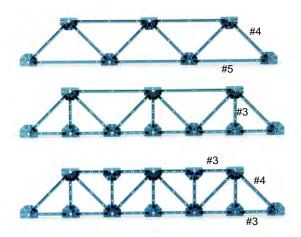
(Top) Warren Bridge. (Middle) Warren with deck verticals. (Bottom) Warren with verticals.
